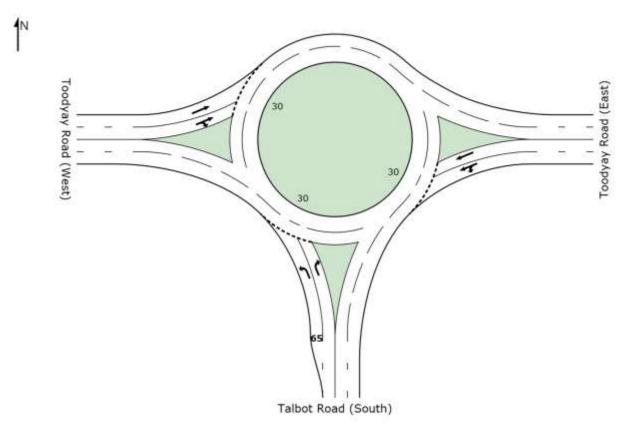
Proposed Intersection Layout of Toodyay Road and Talbot Road
